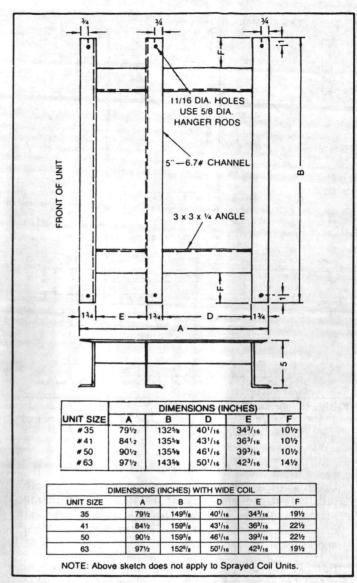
Ceiling Suspension Mounting Frame and Dimensions for Unit Sizes 35 to 63
